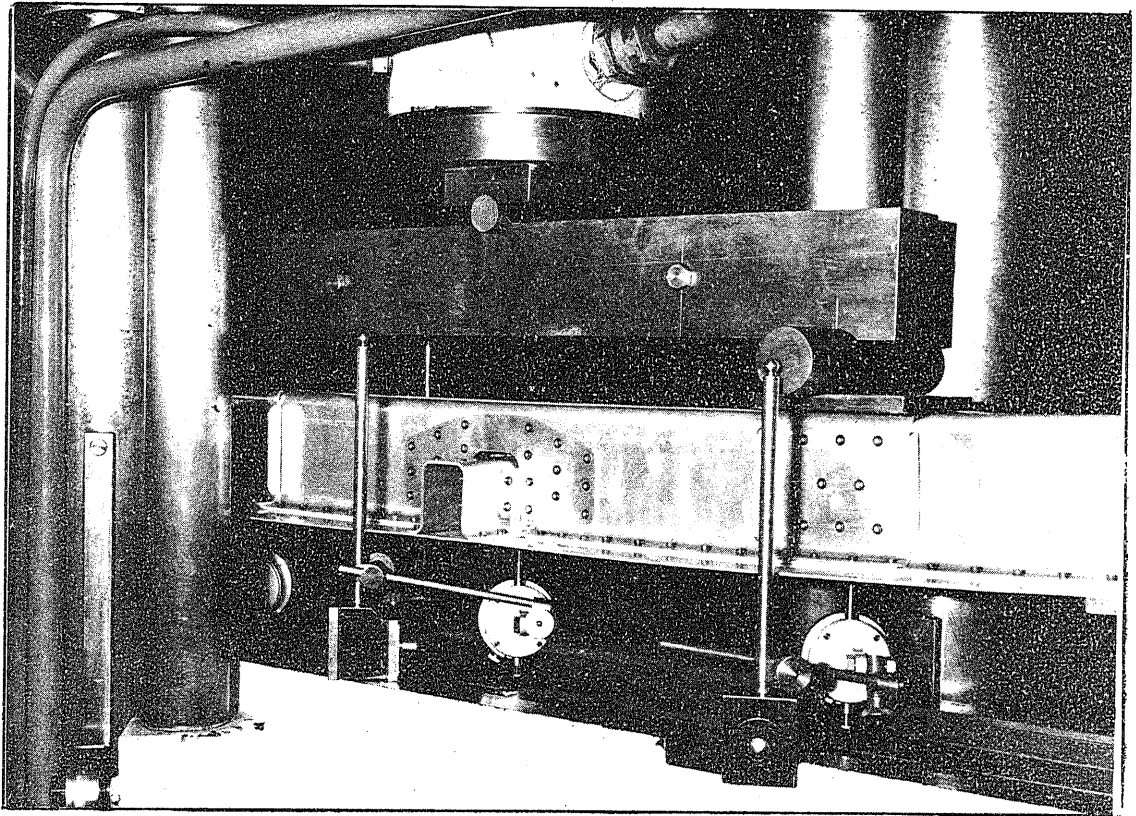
(A) FLOOR BEAM JOINT BENDING TEST
